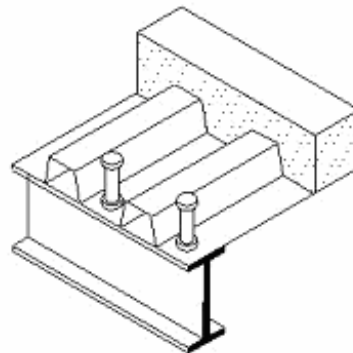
Connection made of anchorage at the end of the slab, welded shear. [29]
